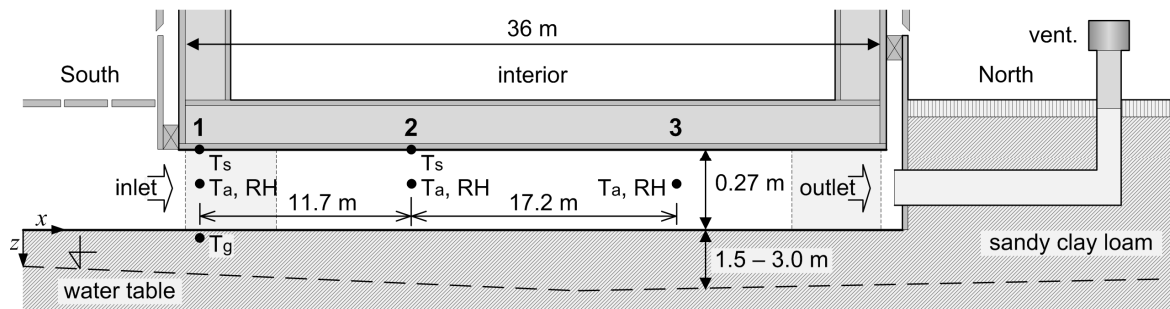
Vertical section of the sub-floor with measuring points (1, 2, 3)
